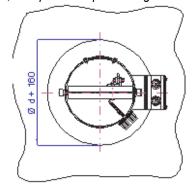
, Round fire damper imbedded into the wall with intumescent gypsum mixture.
